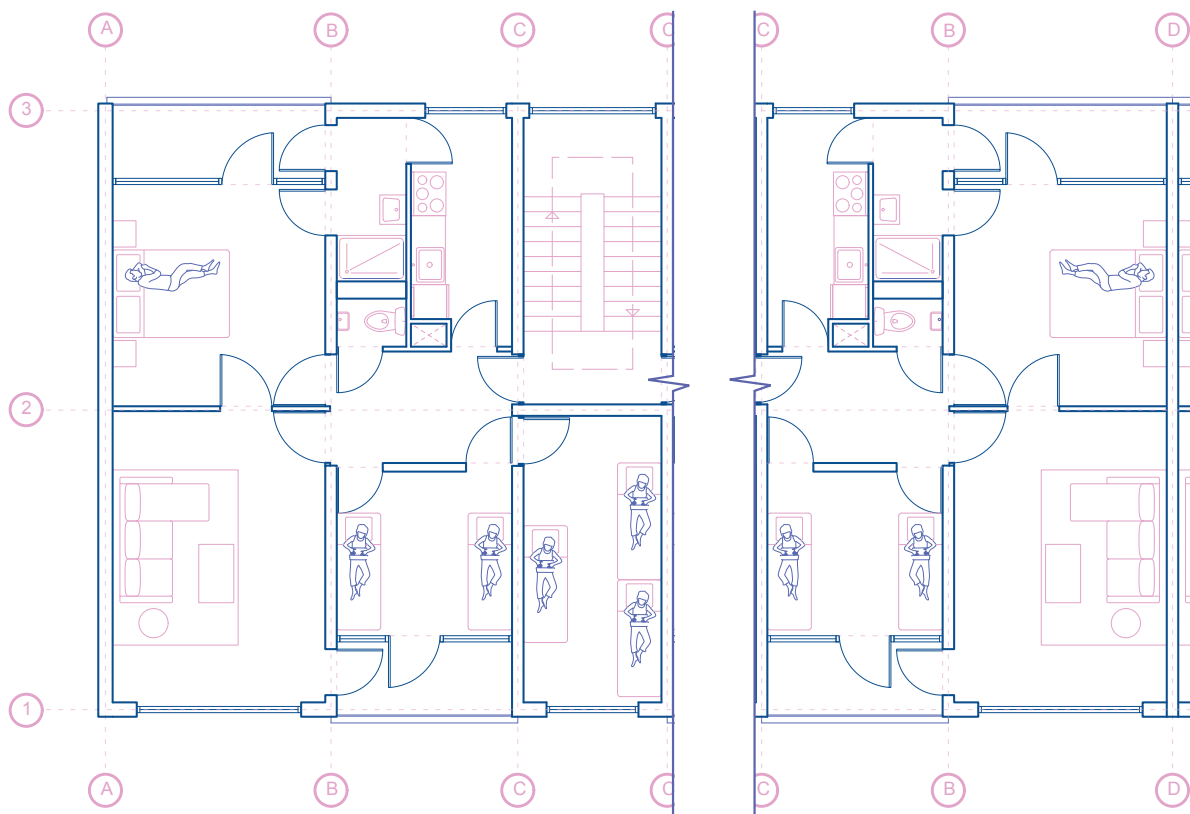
Plan of the existing dwellings in their original layout as intended by the architect. Left: 3 bed and Right is 2 bed (By Author)
